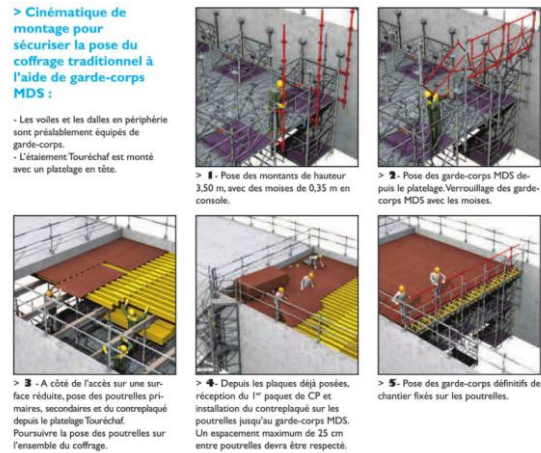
An example of installing scaffolding for slab formwork in a supplier catalogue MILLs formwork. [7]
